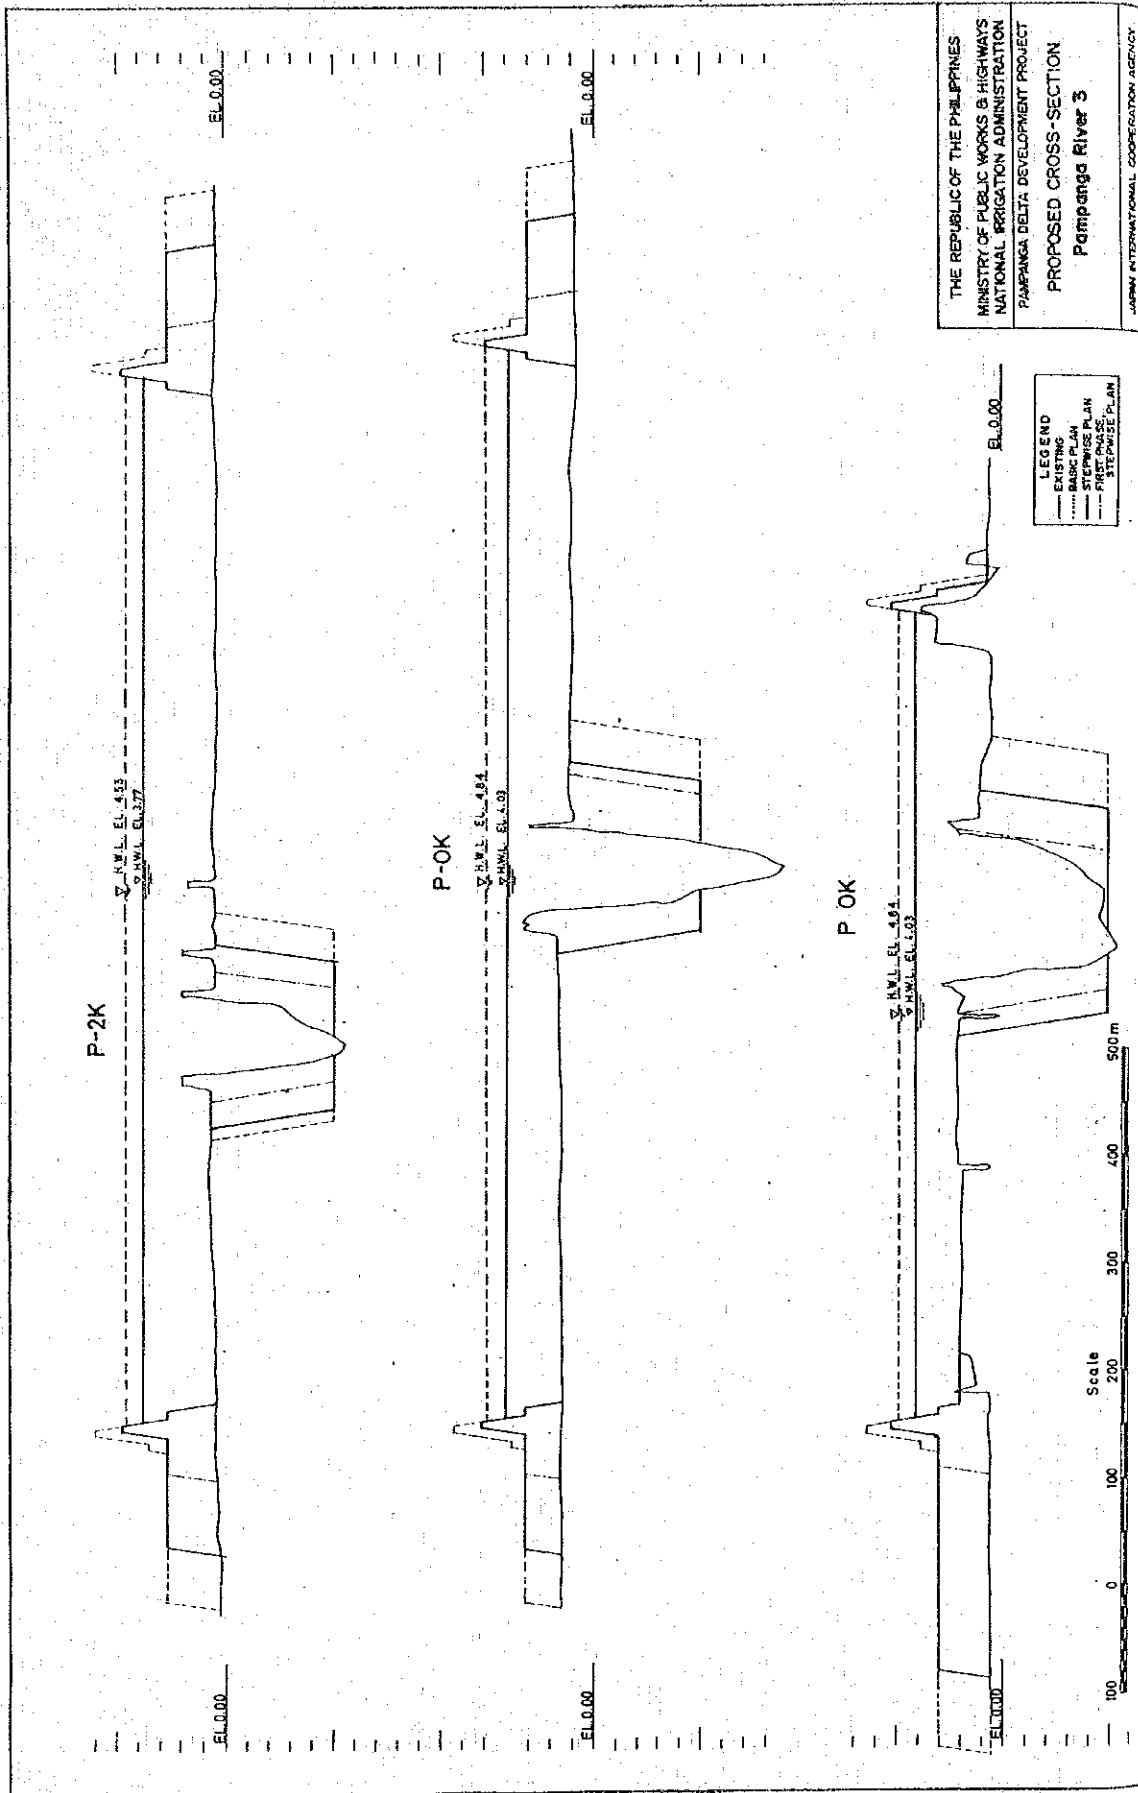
(4) PROPOSED CHANNEL CROSS-SECTION
